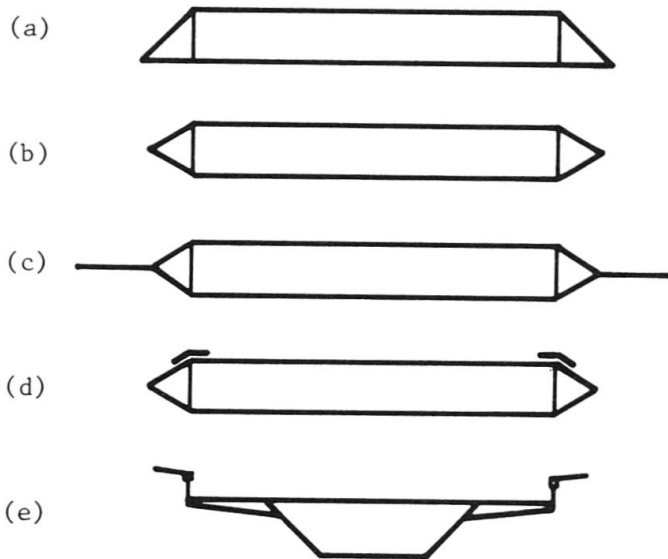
Examples of stabilizers for bridge deck: (a,b) fairing, (c) fairing plus splitter plate, (d,e) flap
